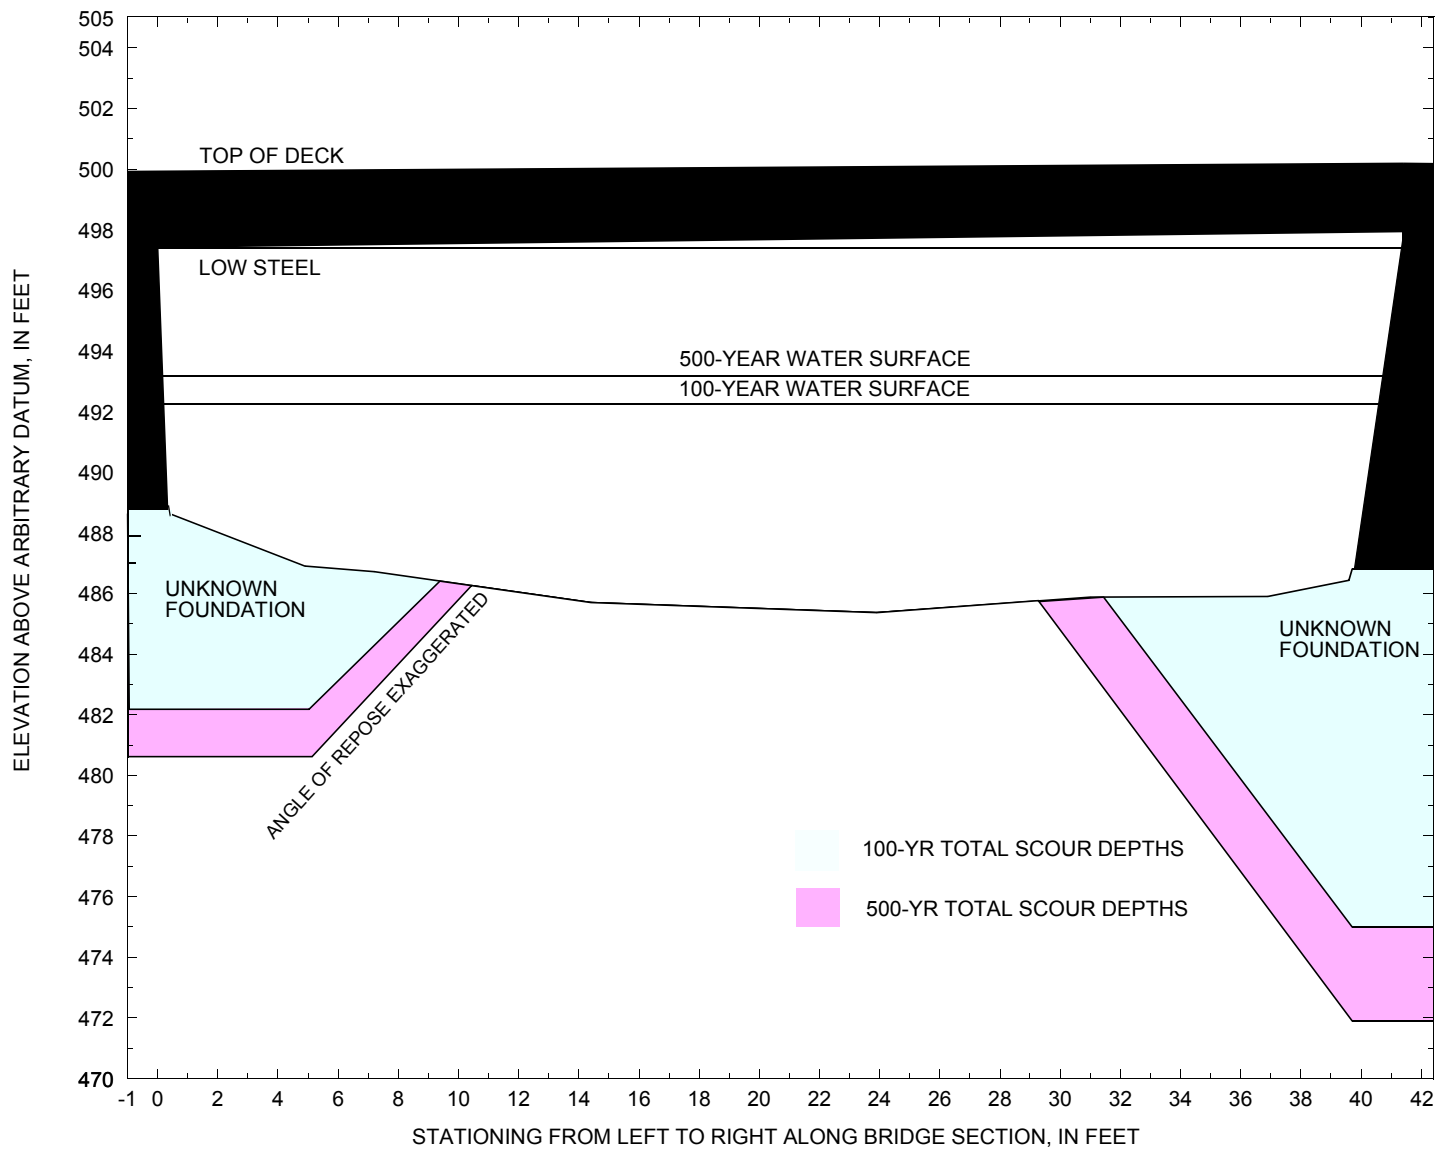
Scour elevations for the 100-year and 500-year discharges at structure WALDTH00180022 on Town Highway 18, crossing Coles Brook, Walden, Vermont.
